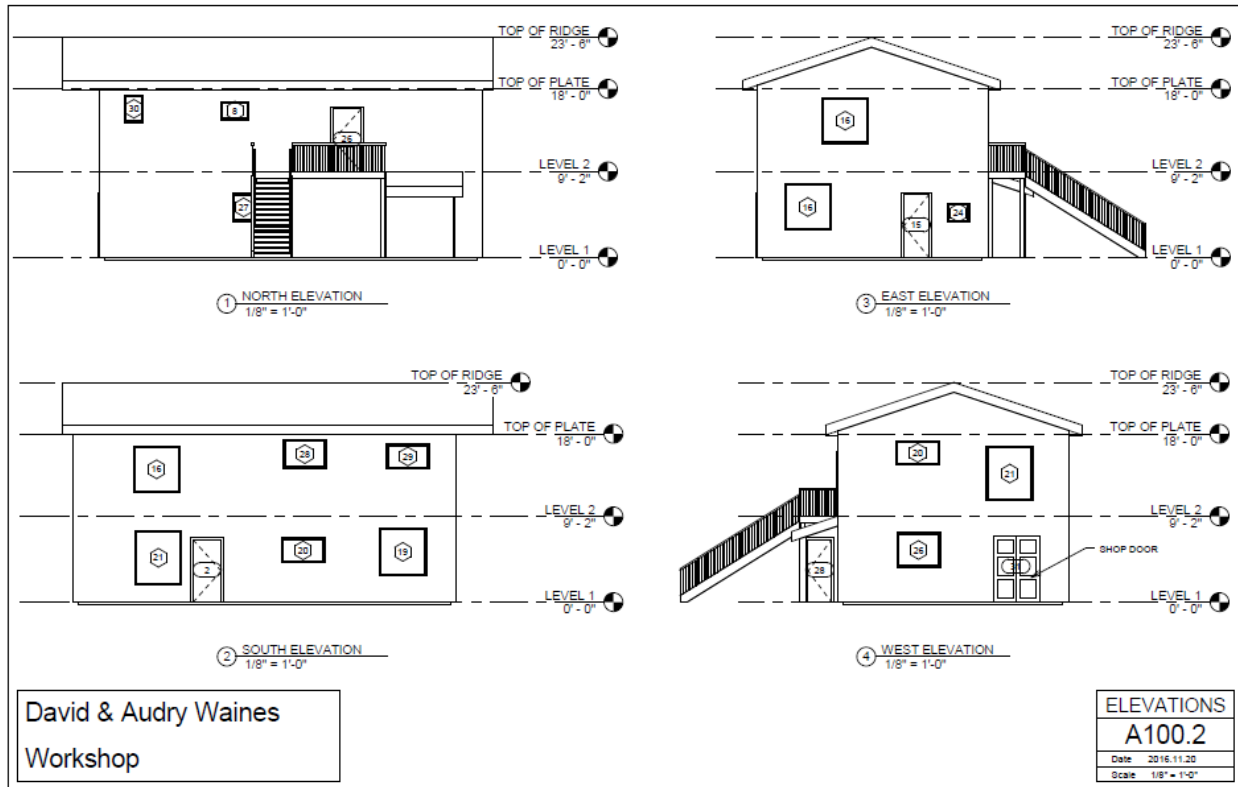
Revised Building Elevations, as Submitted by the Applicant
